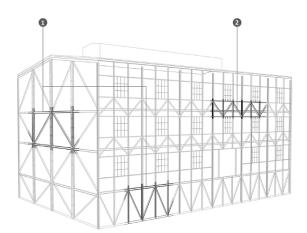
Structural components of the factory facade. 1) braced wall 2) lattice beam (drawing by Katherine Cabezas)
